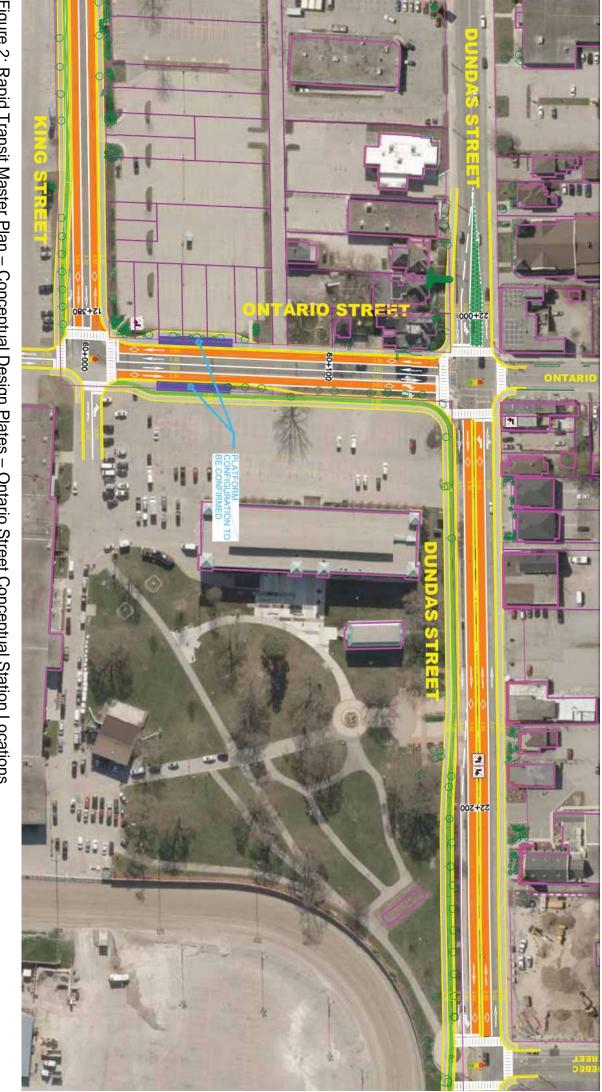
Rapid Transit Master Plan - Conceptual Design Plates - Ontario Street Conceptual Station Locations
